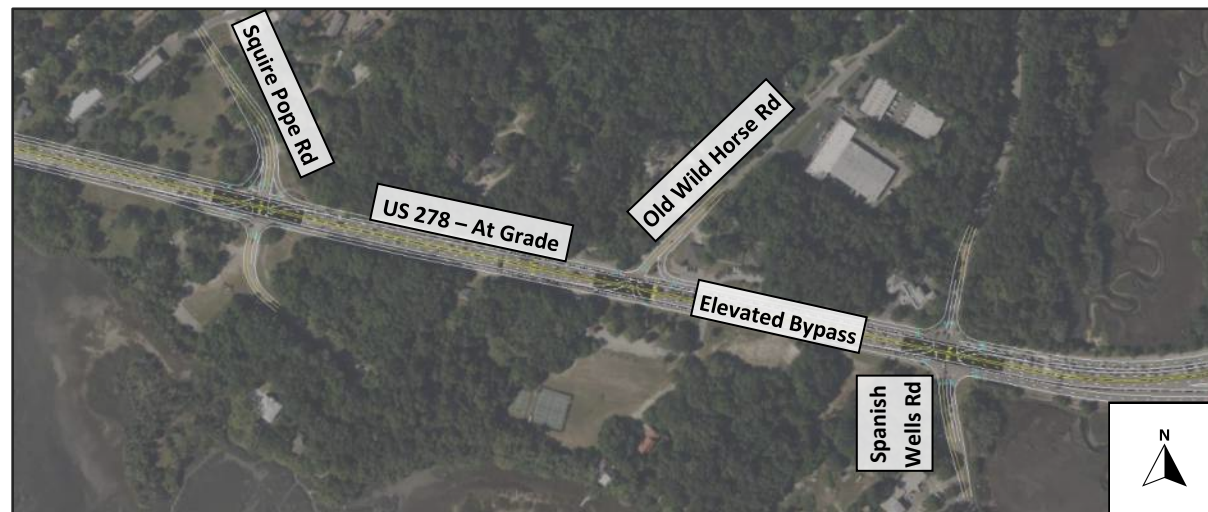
EXAMPLE OF ELEVATED BYPASS - 02
